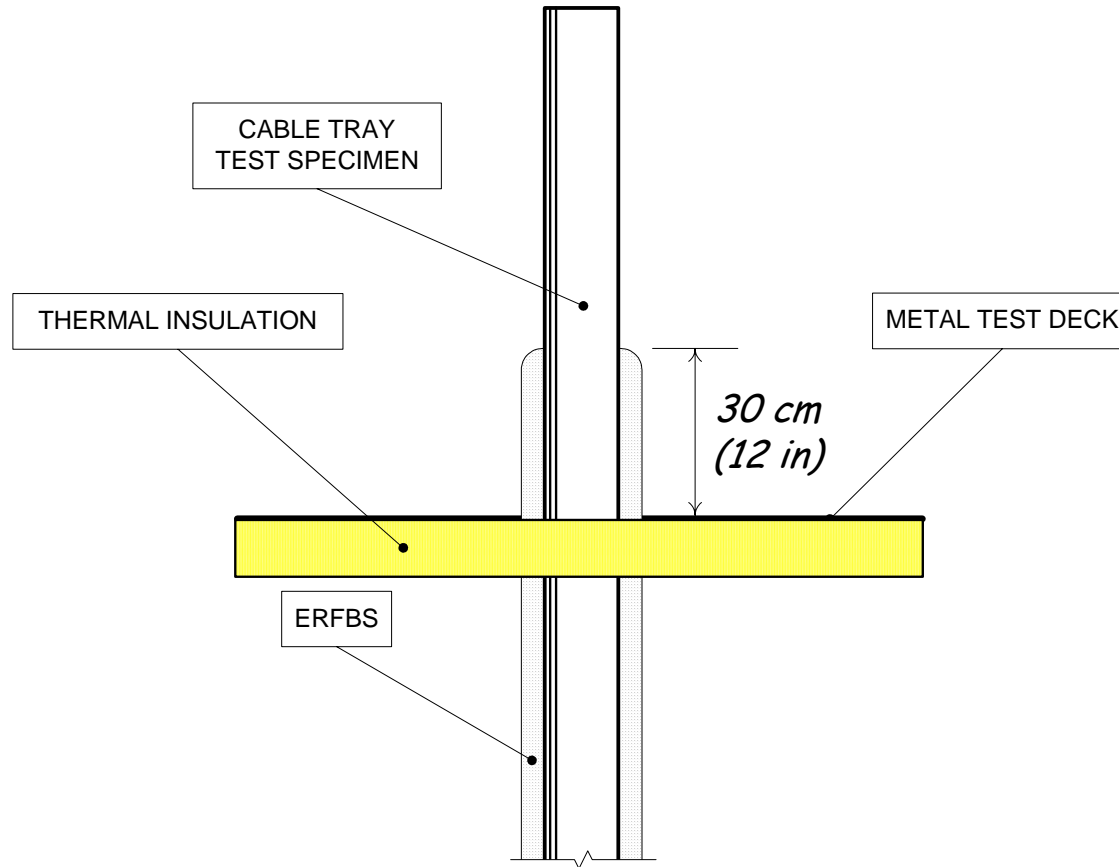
Detail of cable tray test specimen direct attachment ERFBS extension through the test deck.
